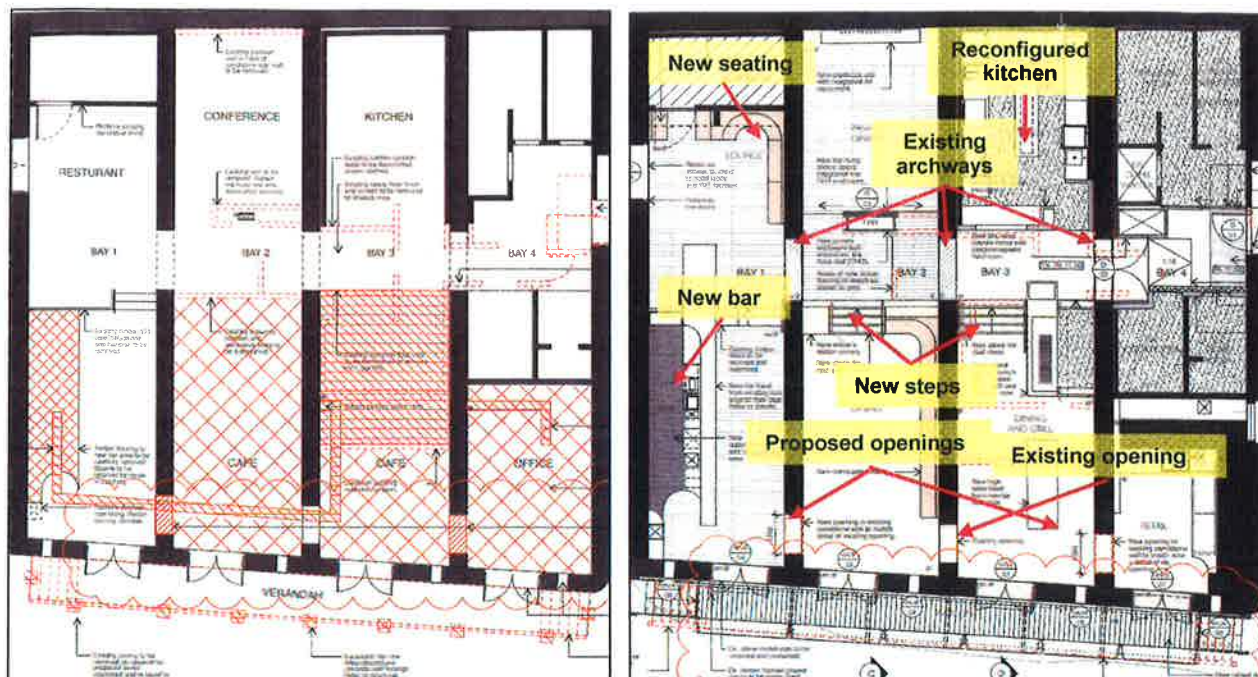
Demolition (left) and proposed (right) groundfloor/basement plan showing internal works (Source: Applicant's EIS).
